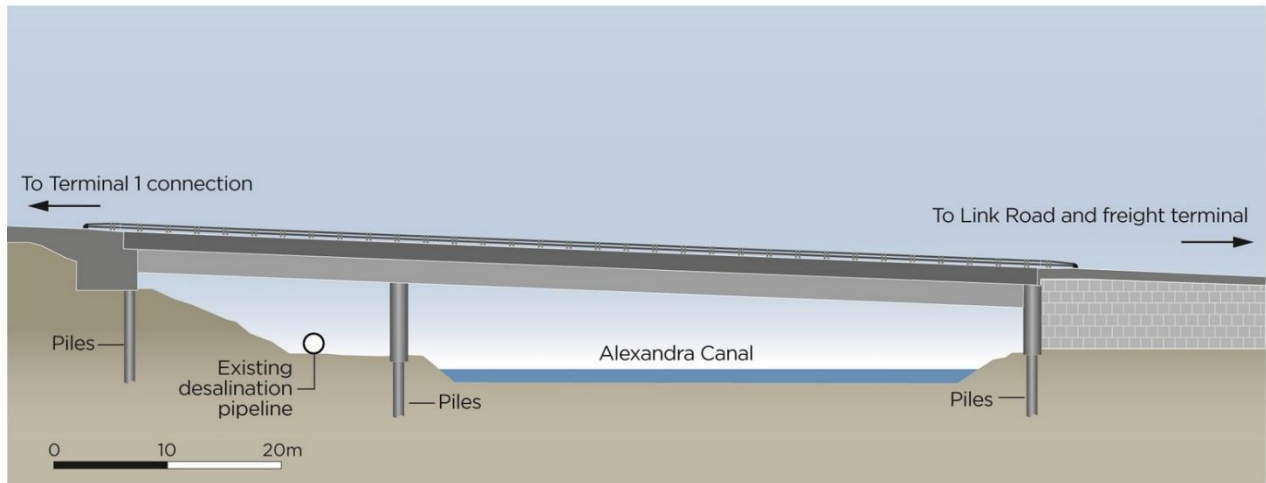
Preferred steel box girder bridge for the freight terminal access bridge
